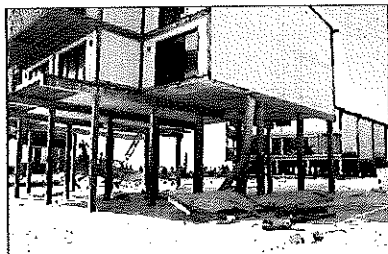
Shore-perpendicular reinforced masonry wall failed and collapsed into the foundation of an adjacent building, contributing to failure of the corner foundation piling and pile cap/beam.
